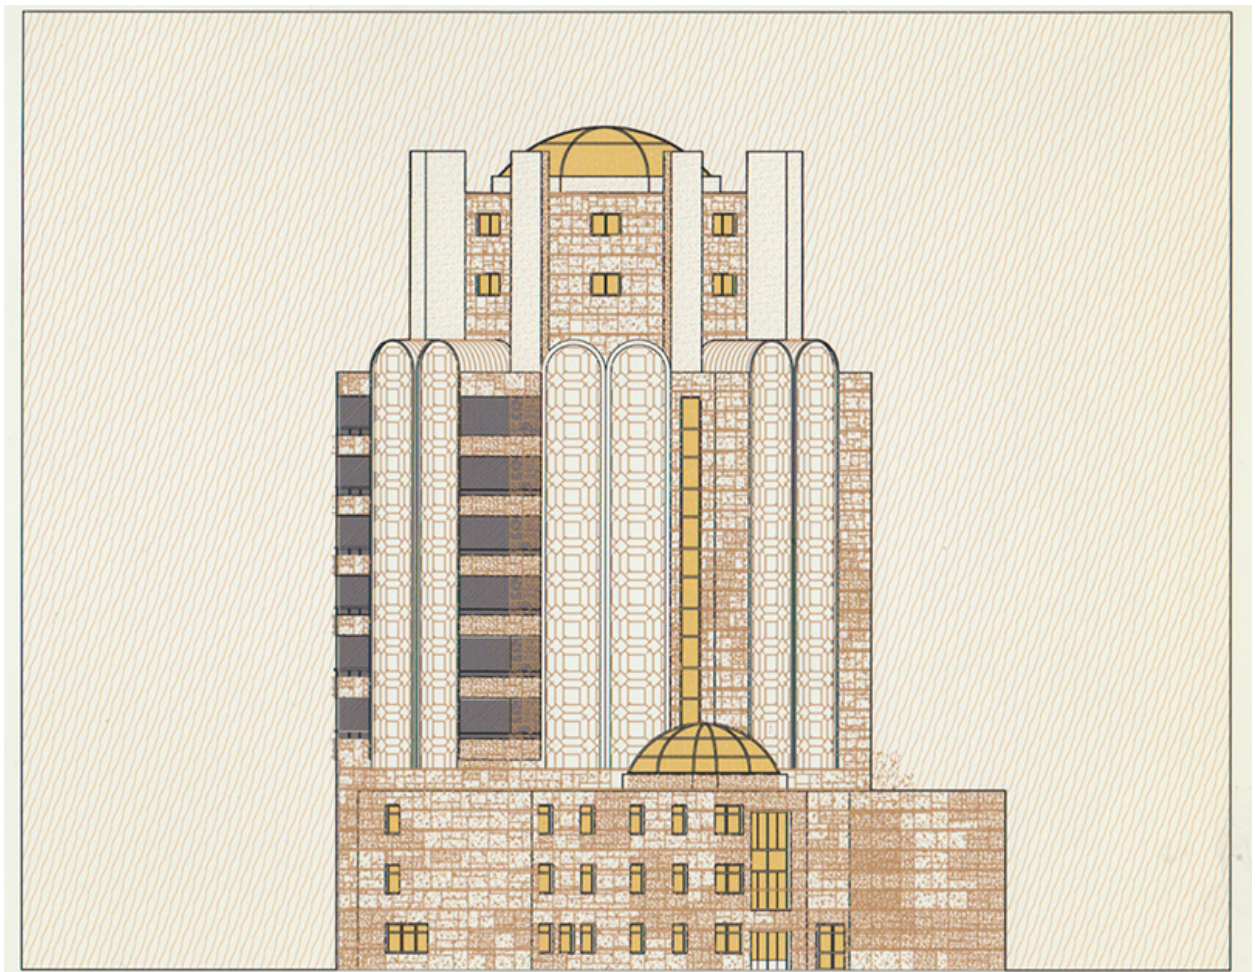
New Hospital tower building (Source: Authors' archive, 2000).
